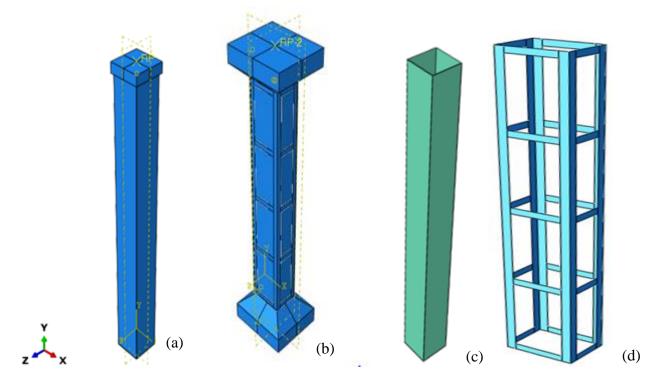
Sample Finite element models for (a) RC jacketed column b) steel jacketed column
